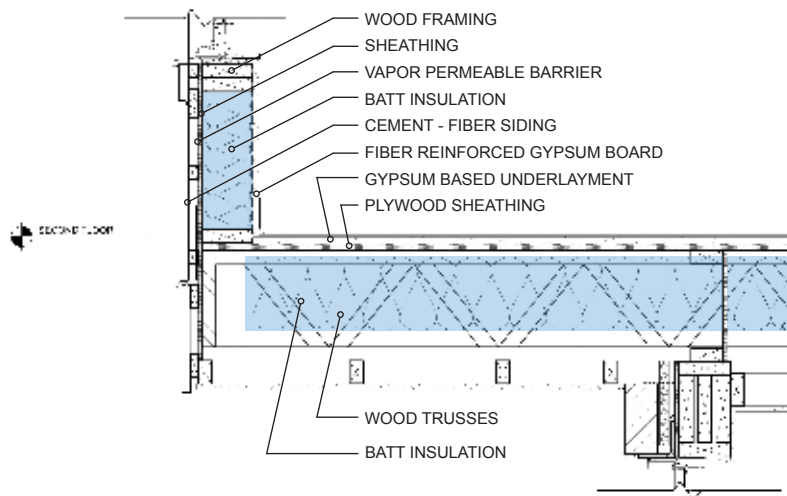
A typical frame structure using batt insulation faces the challenge of being penetrated by various materials as well as outlets, conduit and ductwork. Drawing: Little Diversified Architectural Consulting
